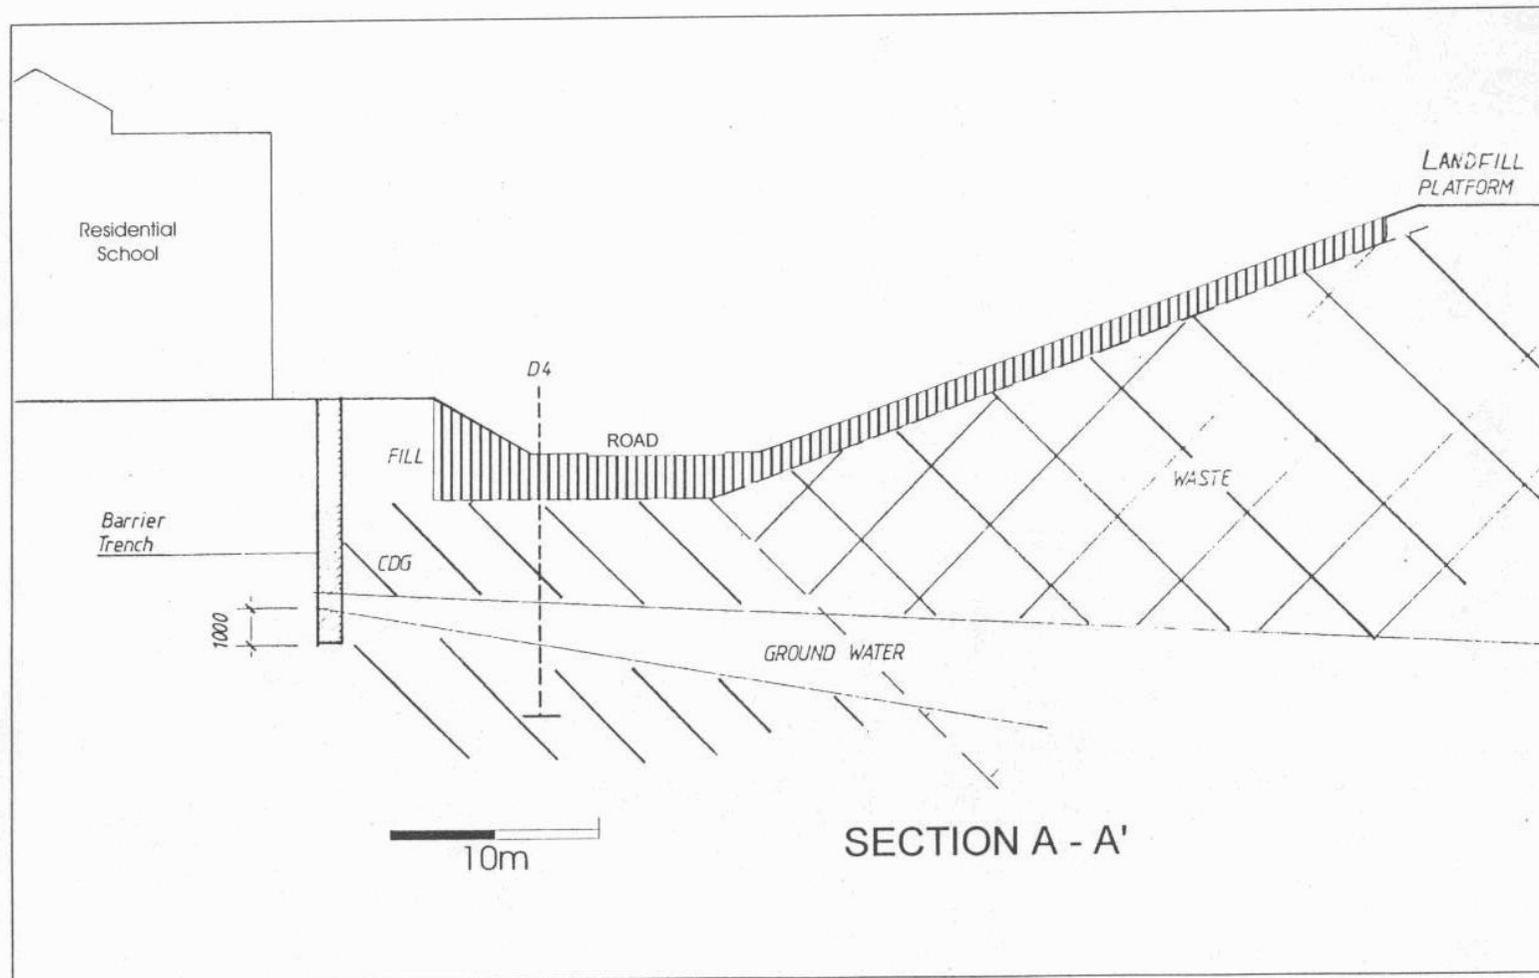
CROSS SECTION OF RESIDENTIAL SCHOOL AND LANDFILL
